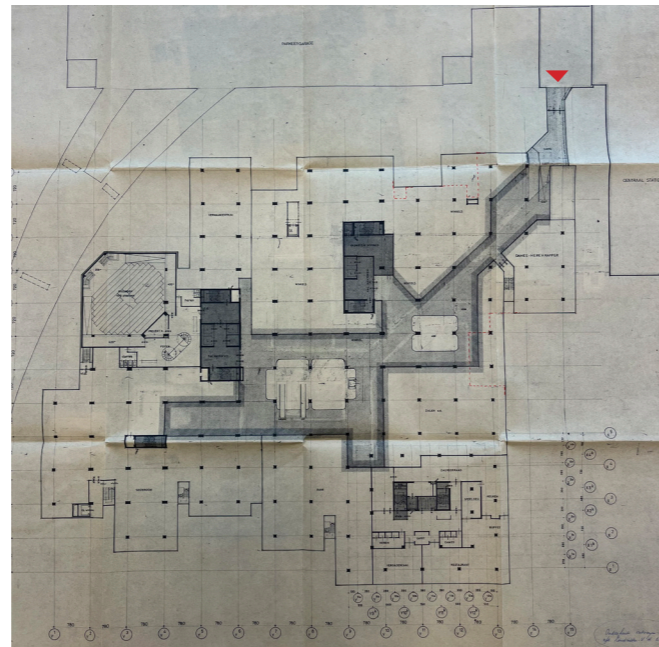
Architectenbureau Lucas & Niemeijer. Floor plan highlighting entrance from central station and walkways.
